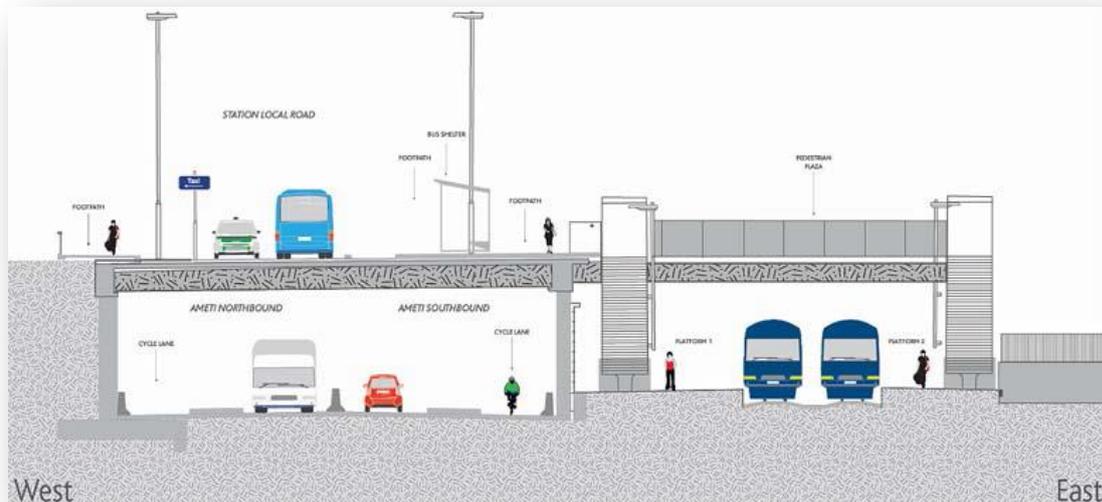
Cross section showing AMETI Phase 1 road and rail tunnel arrangement (Source: Auckland Transport)
